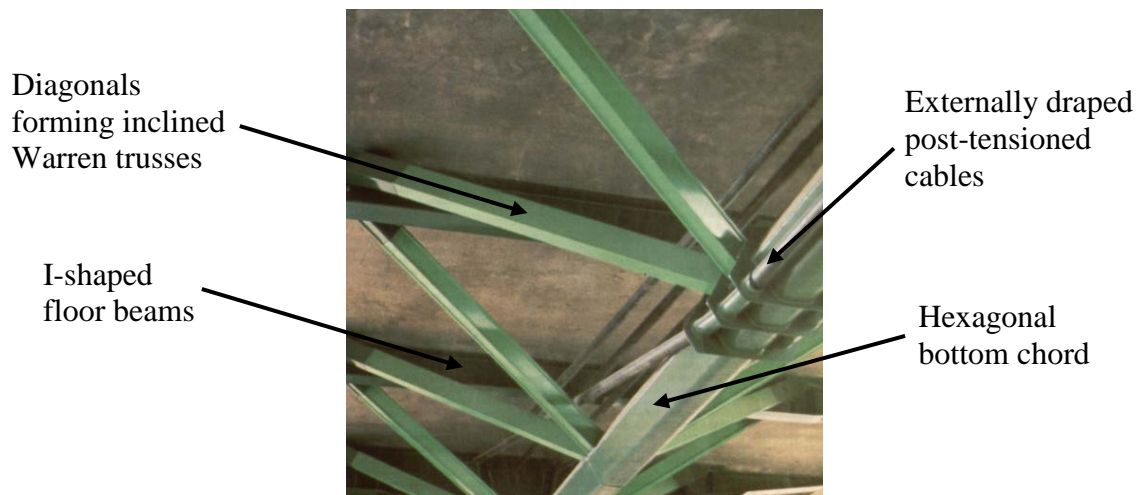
Space Truss Superstructure of the Roize Bridge (Muller 1993)
